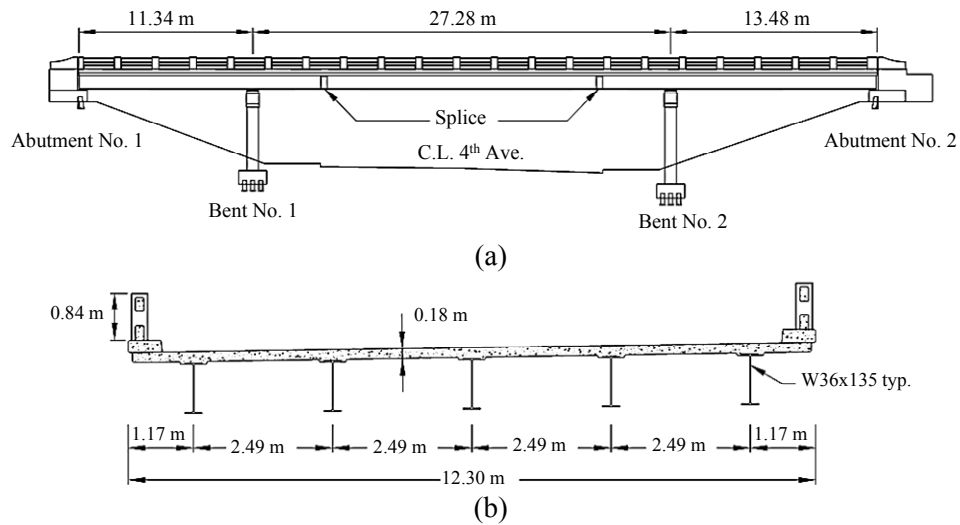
I-40 westbound bridge over 4th Avenue: (a) Longitudinal profile (b) Cross-section (modified from Ragland et al. 2011)
